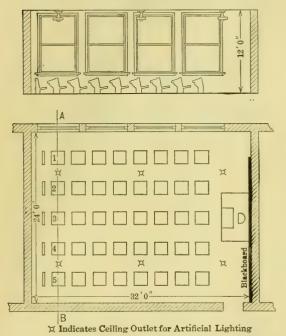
Elevation and Plan of a Classroom Illustrating the Position of Outlets and Luminaires of a Direct Lighting System. In modern practice in classrooms the width varies from 20 ft. to 25 ft., the length from 28 ft. to 32 ft., and the height from 12 ft. to 14 ft.
